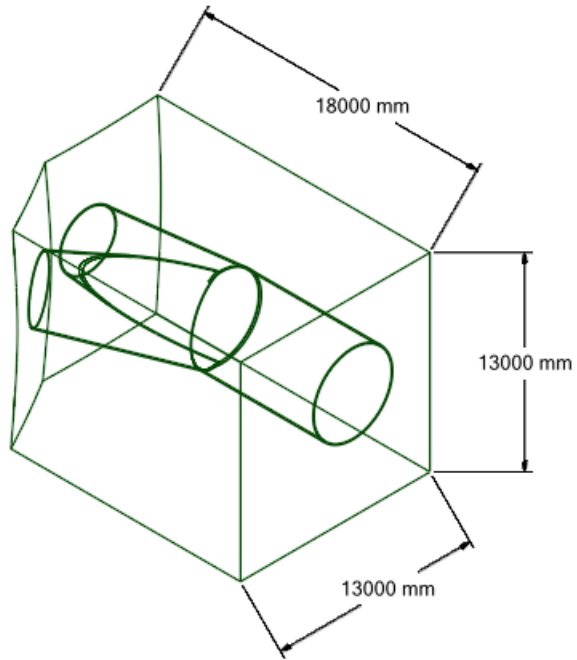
Dimensions of concrete block covering second bifurcation without reinforcement
